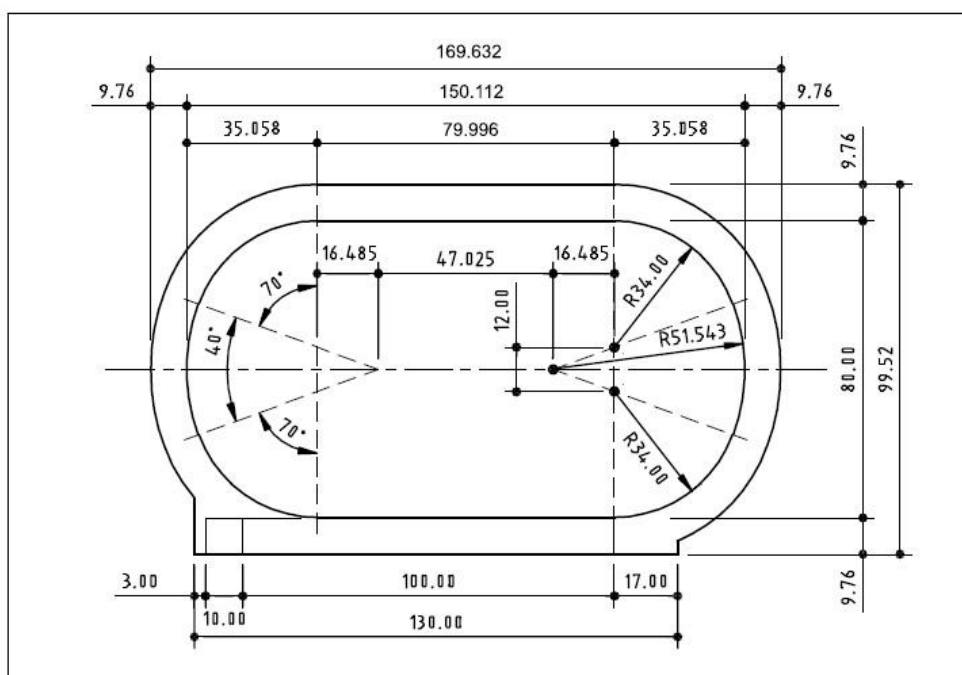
Shape and dimensions of 400m Double Bend Track (Radii 51.543m and 34.00m)
